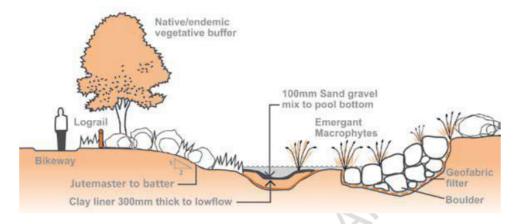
Elements of the Natural Drainage System. Sources: Stormwater outlets in parks and waterways (Brisbane City Council, 2001).
